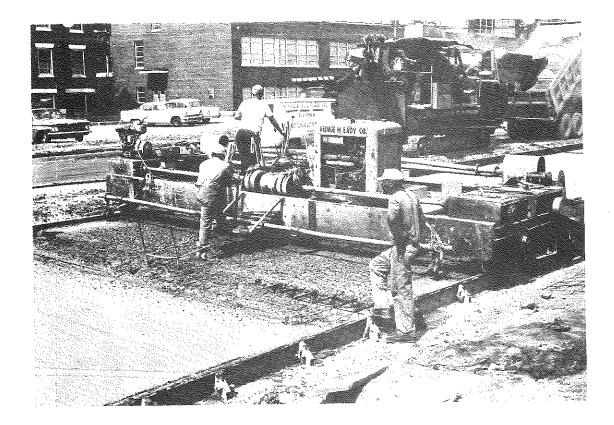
Tie Bars Installed at 30-inch Centers Along Longitudinal Joint
